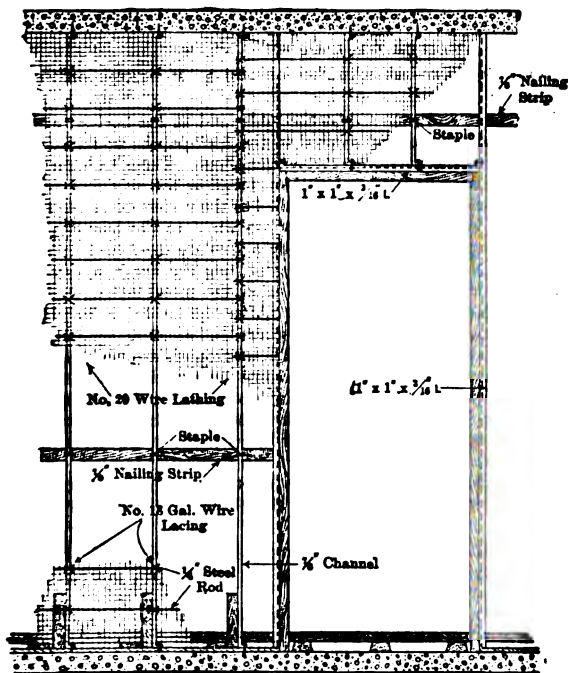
Two-inch Solid Plaster Partition. Elevation
